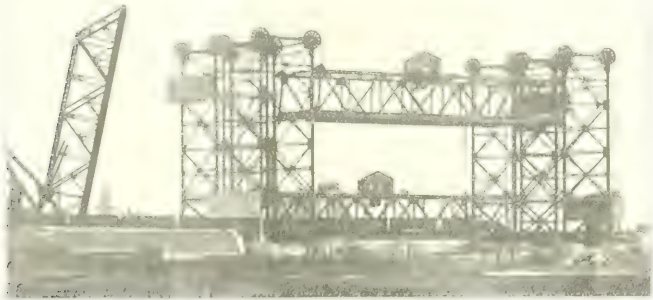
BRIDGE OVER THE COLUMBIAN RIVER, SHOWING THE LOWER SECTION OF THE BRIDGE.
